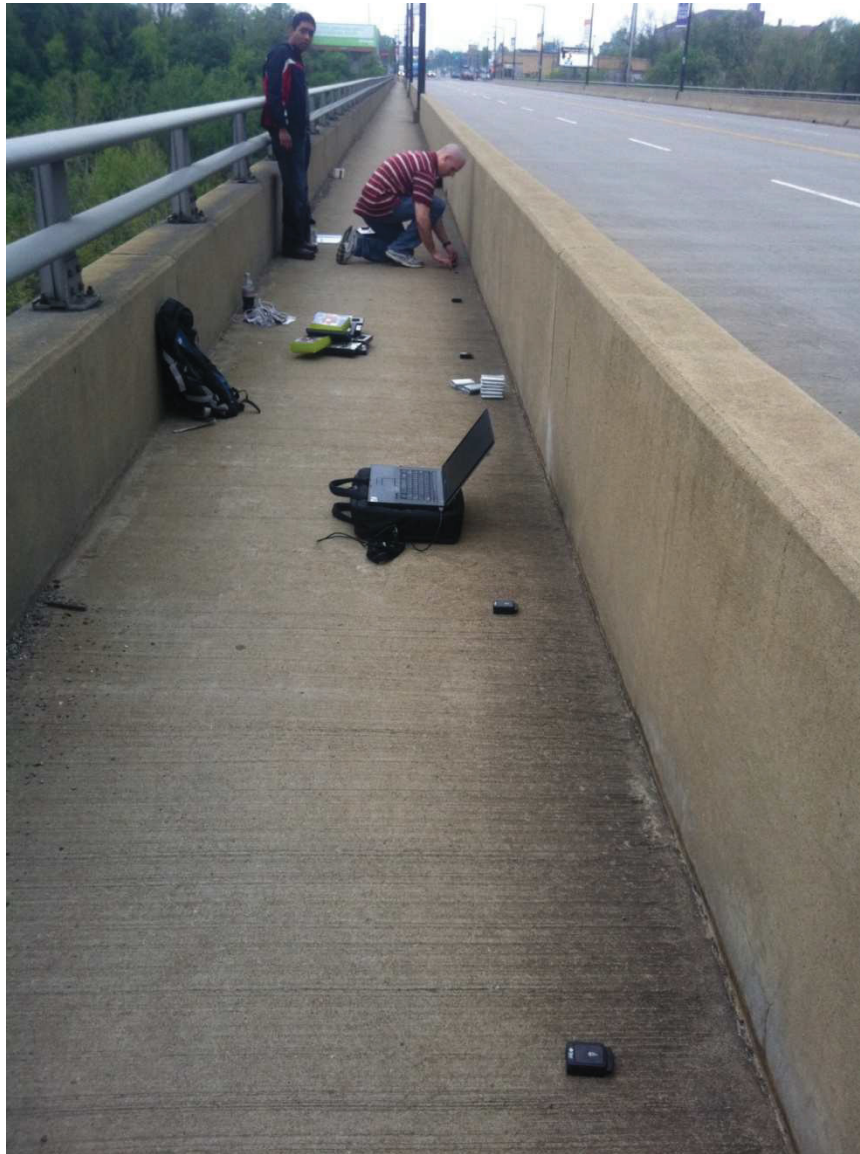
Installation of sensors on the sidewalk of Market Street Bridge.
